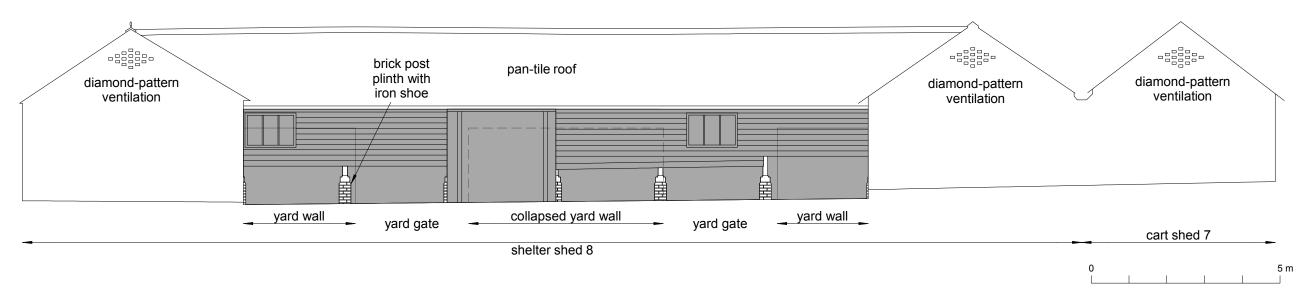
Kitchen Farm, south-west elevation with alterations shaded grey.
